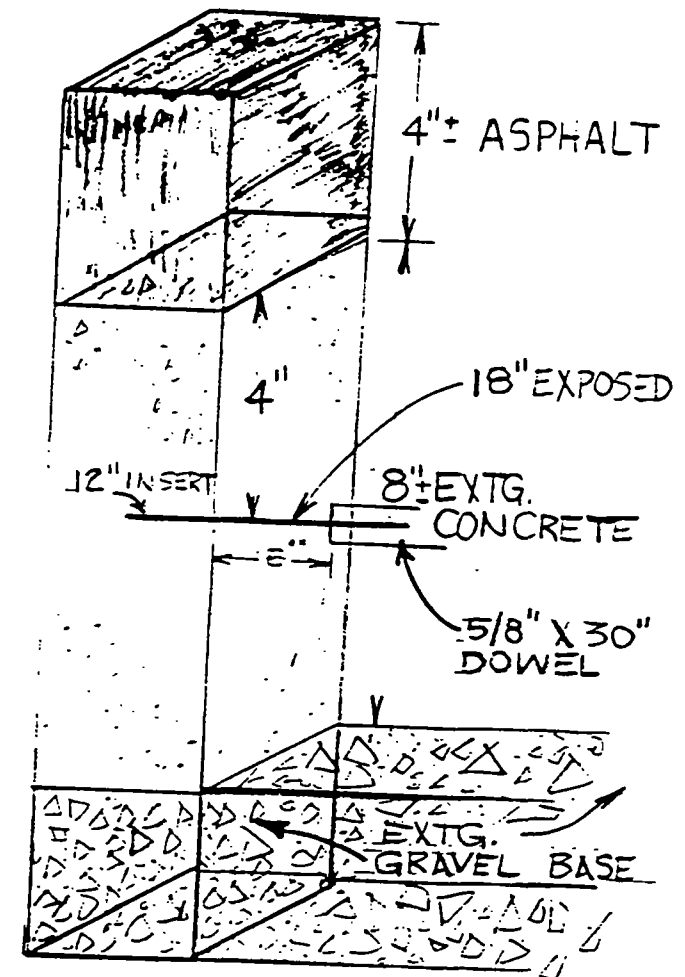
PLAN VIEW (TRENCH CUT-OUT)
